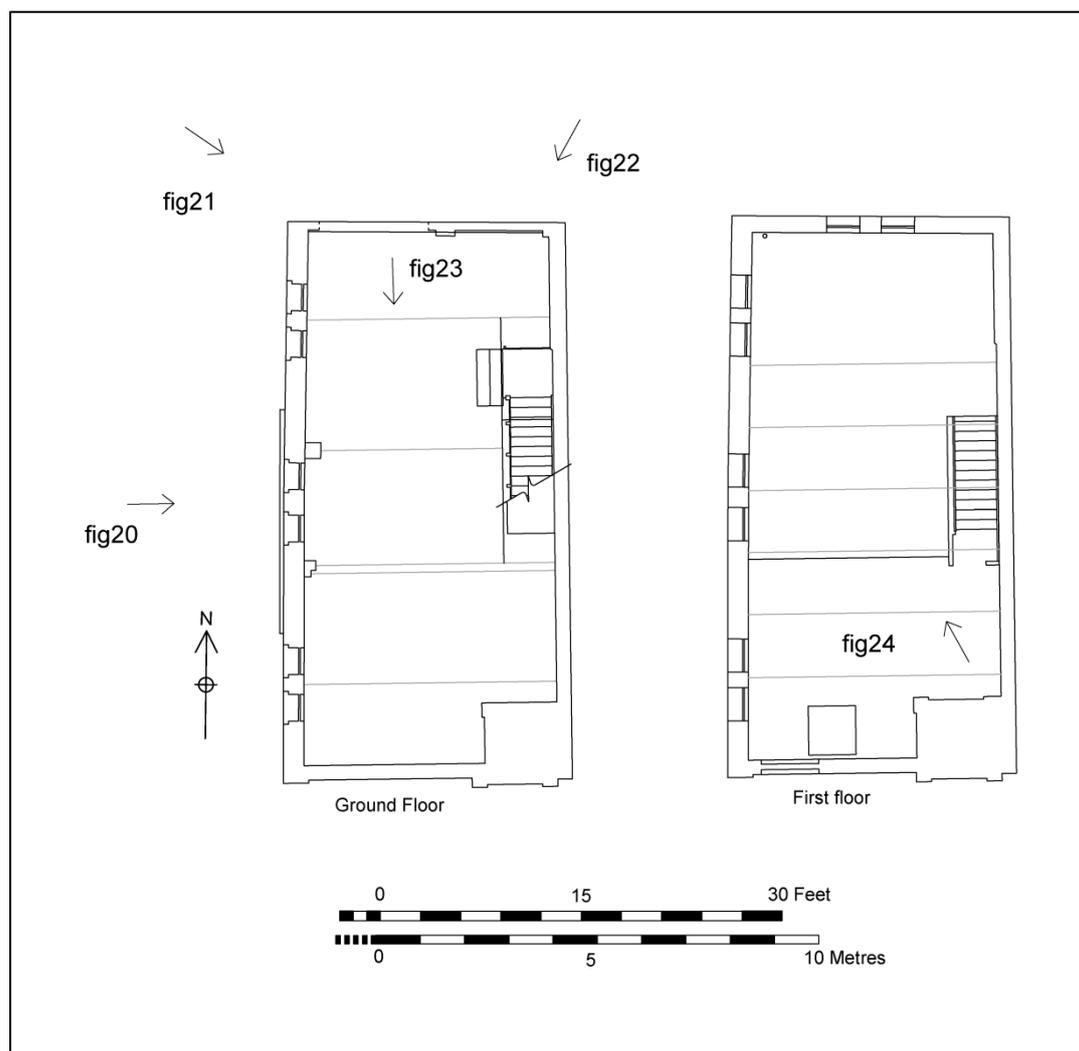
Location of selected photographs (figs 20-24) on ground and first floor plans of Pump House (plans produced by Greenhatch Architects).
